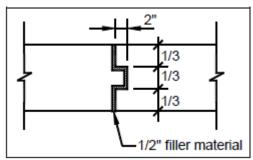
TYPICAL CONTROL JOINT DETAIL
